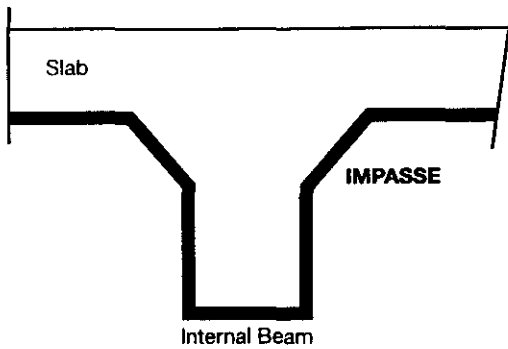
Shows position of Impasse Barrier installed beneath the internal beam and slab panel.
